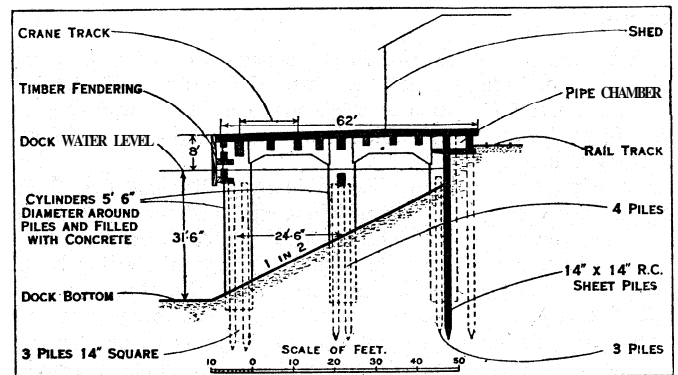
CROSS SECTION OF REINFORCED CONCRETE QUAY ON PILES AND CYLINDERS, VICTORIA DOCK, LONDON, BUILT 1925
